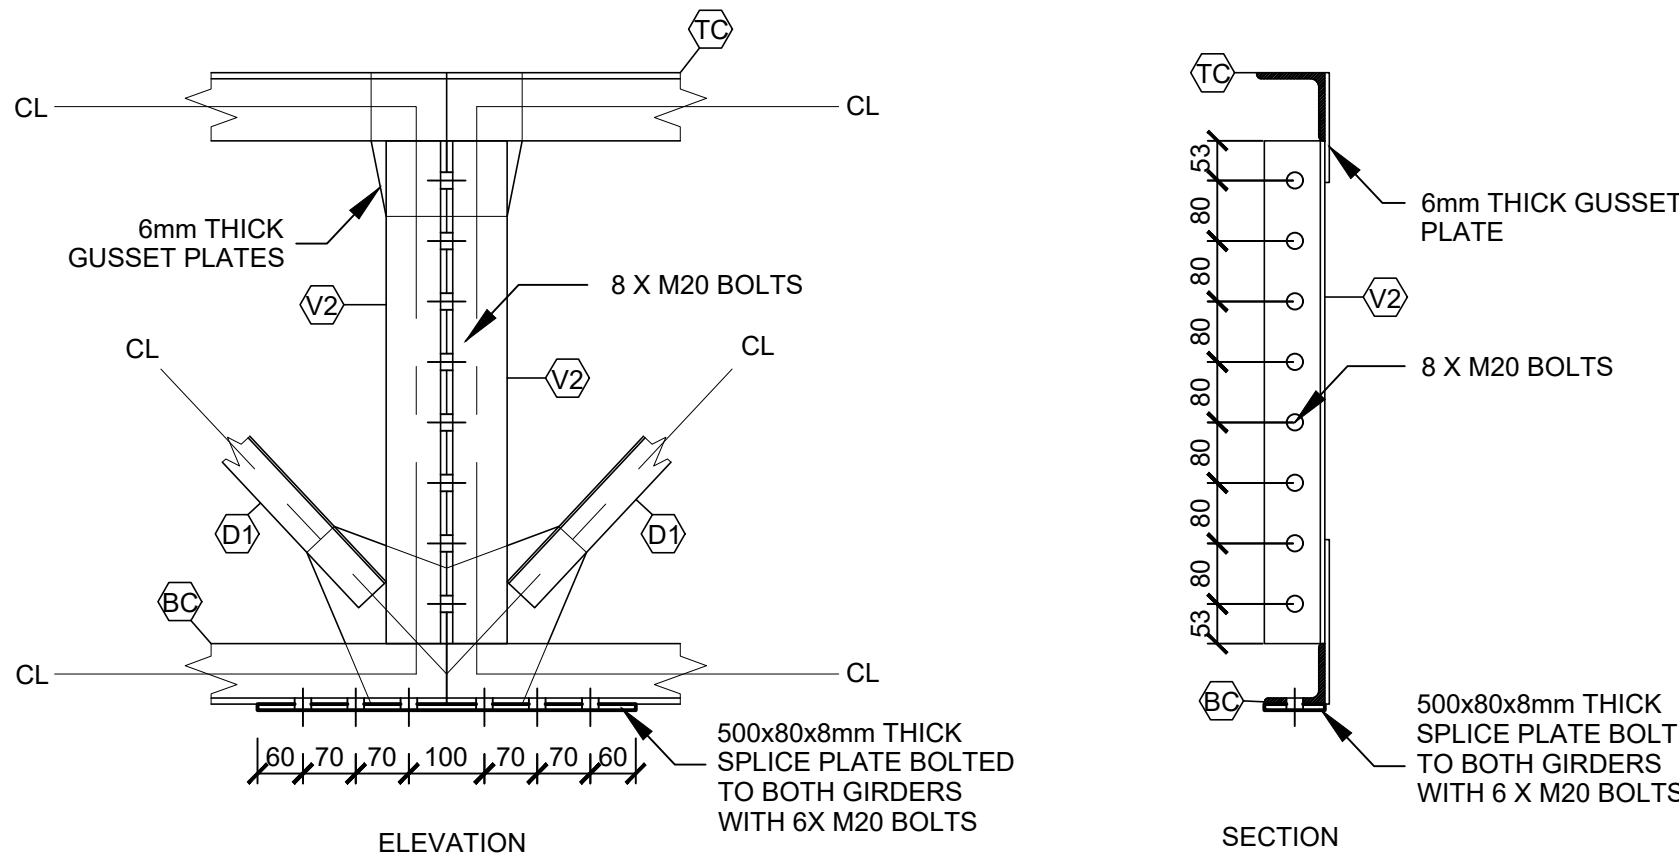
DETAIL D - BEAM TO TOP CHORD CONNECTION DETAIL
